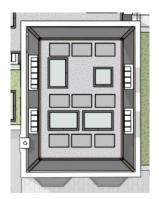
Potential solar PV layout (subject to design development and detailed survey of the roof)
